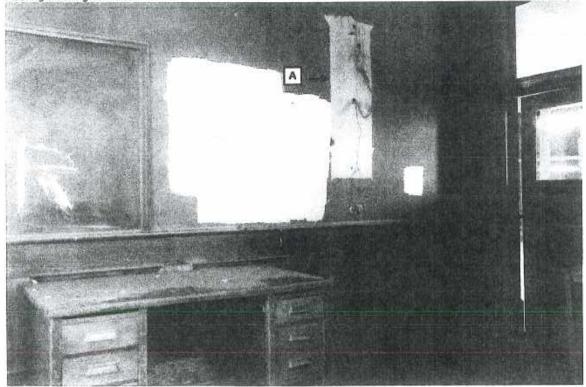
Room 19 view southeast. (A) Ghost marks of wall-mounted clock.
